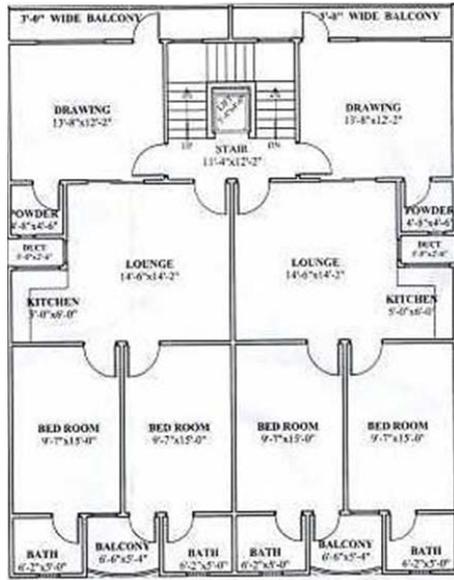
Typical floor plan of an apartment block in Clifton, Karachi. The floor contains two individual housing units for two different families.
